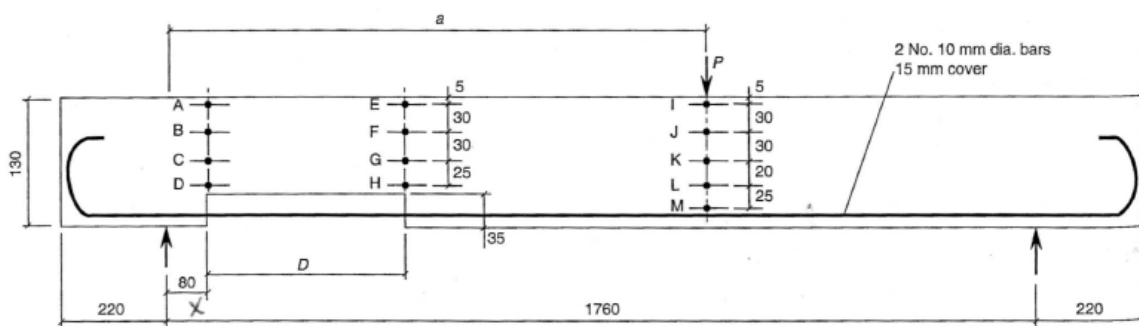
Details of Small-scale Test Specimens with Width = 75 mm (Raouf and Lin 1997).
